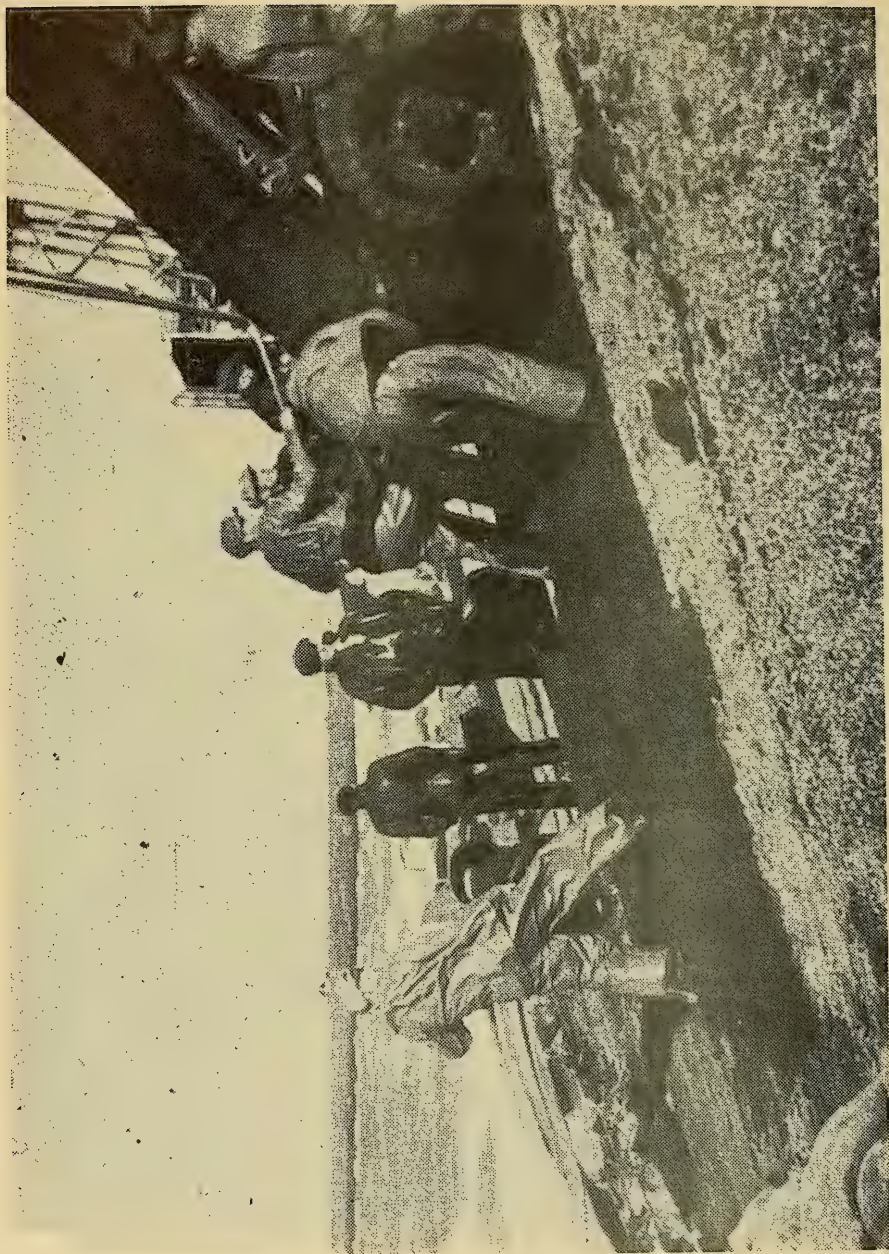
New North harbor dam at Harlingen. Dumping and spreading bituminous sand on the outer slope.
